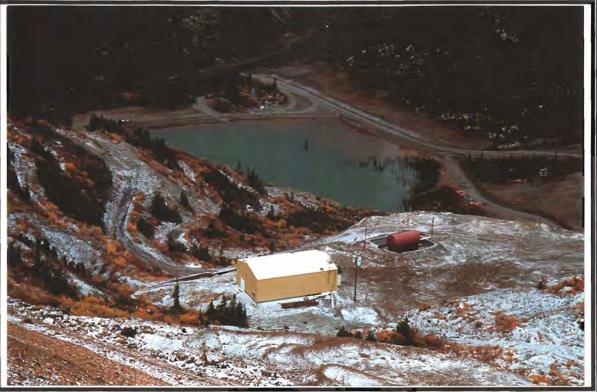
Mine dry and Aboveground Storage Tank (AST) at 1510 portal. Tailings pond and Cache Creek diversion in background.
